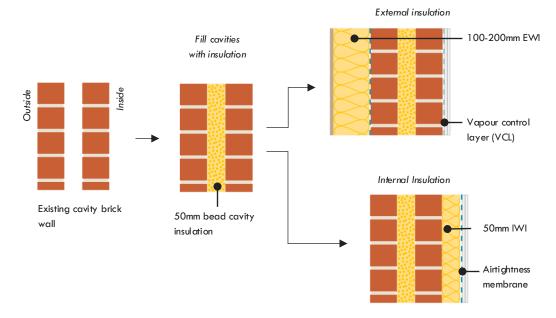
Options for insulating cavity walls. For step 1 ensure measures have been made to prevent condensation.
